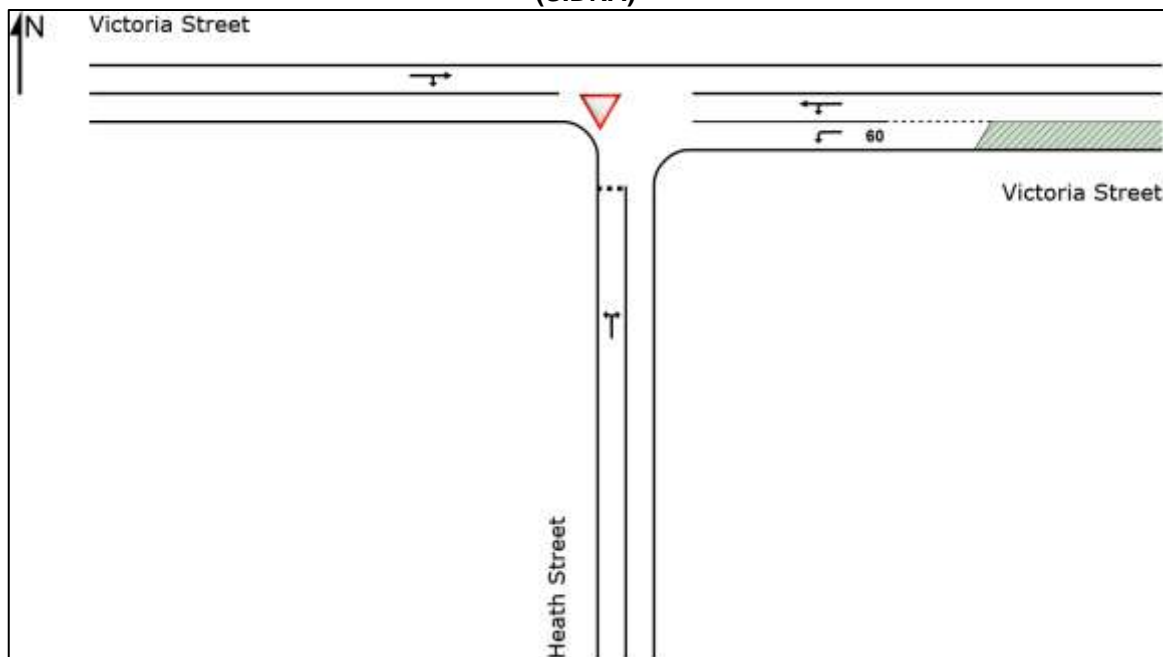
Priority Intersection Layout of Victoria Street with Heath Street(SIDRA)
